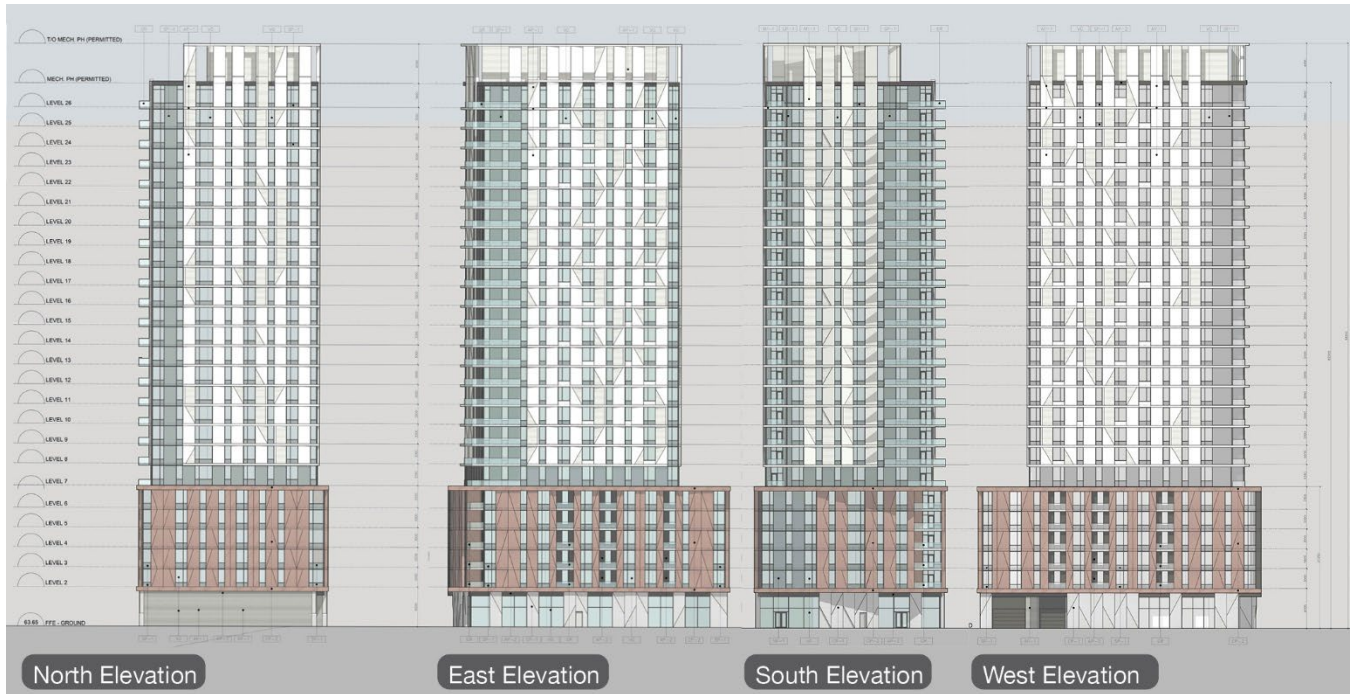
Elevations of proposed Building 1, which will be contemplated as part of a forthcoming Site Plan Control application.
